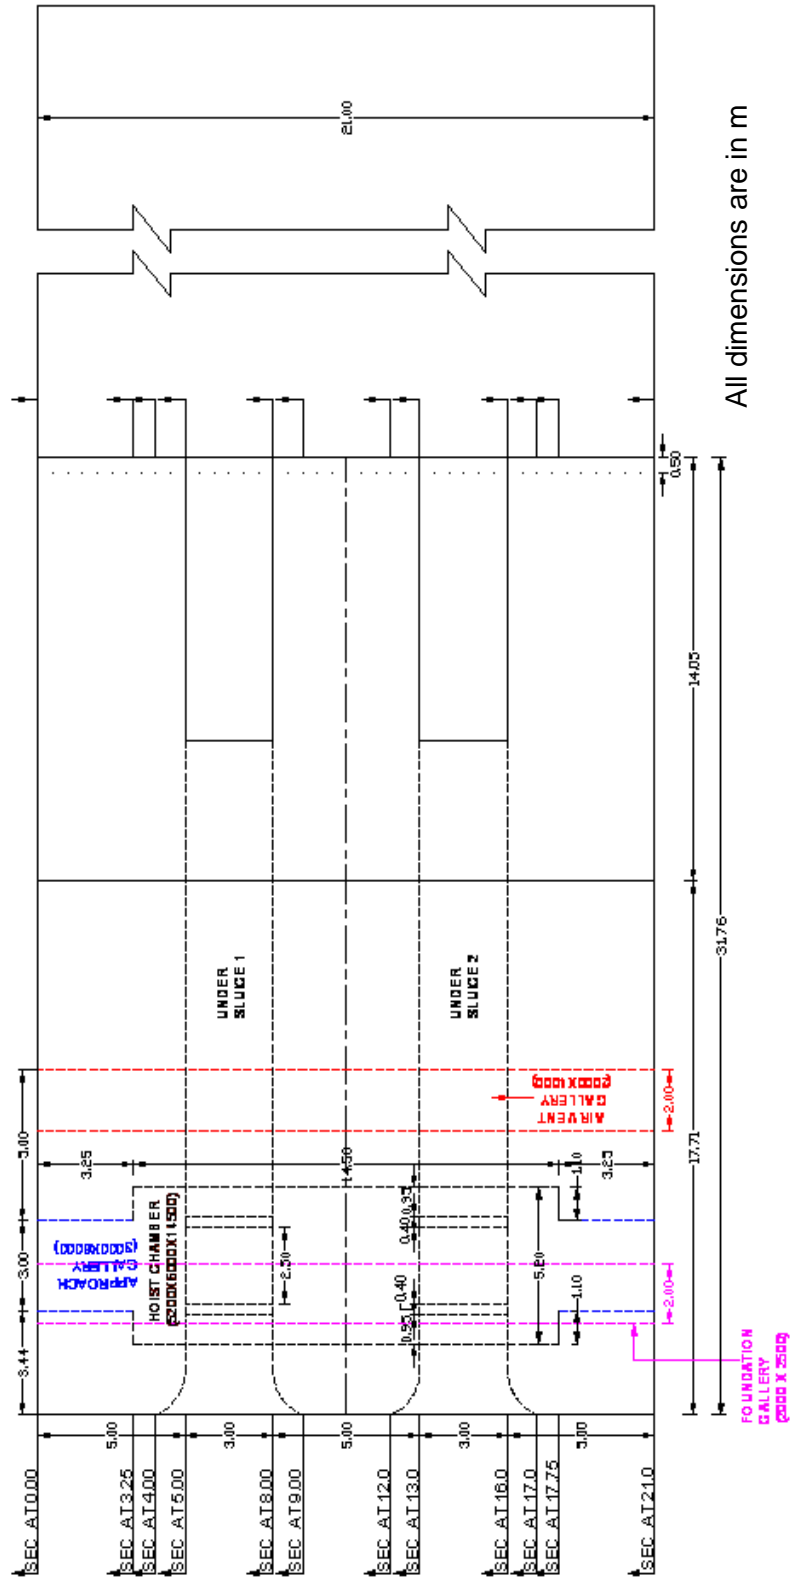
2 : TYPICAL PLAN OF WITH SELECTED SECTIONS
